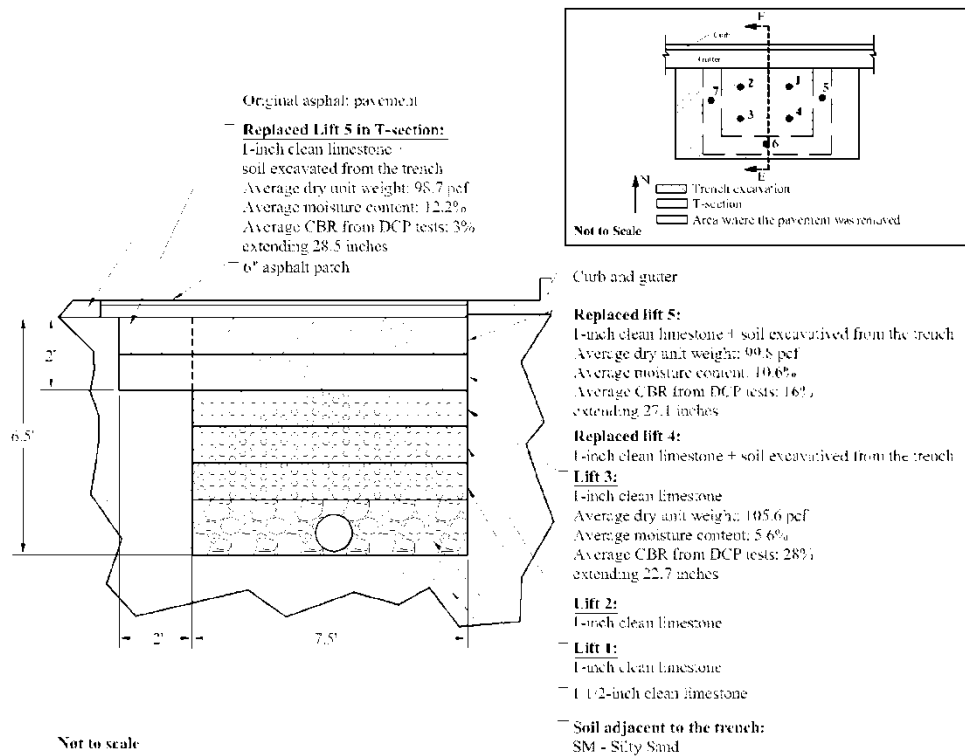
Cross-section of Trench E on July 18, 2007; (a) plan view, (b) cross-section
